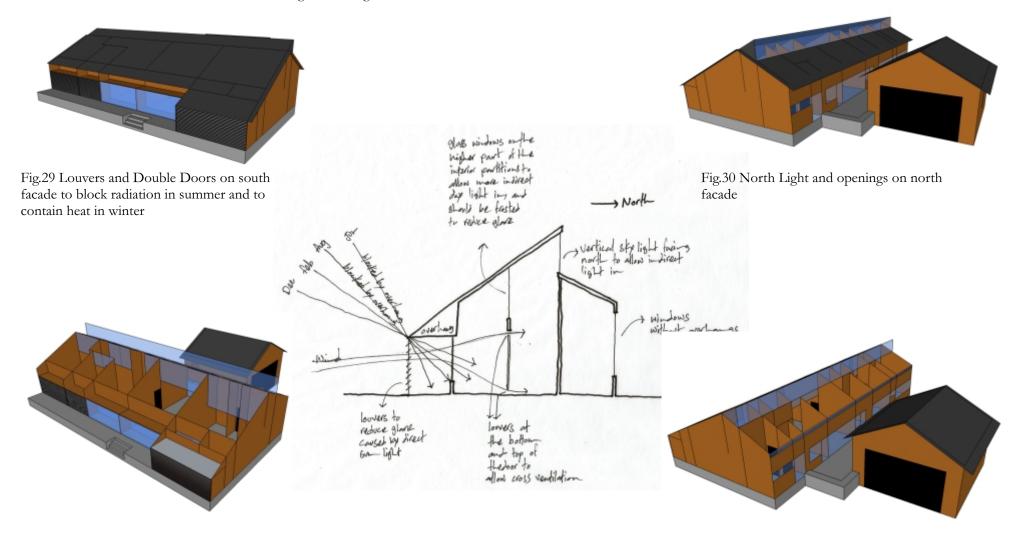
Fixed glass in top part of wall to bring in light from north facing skylight
